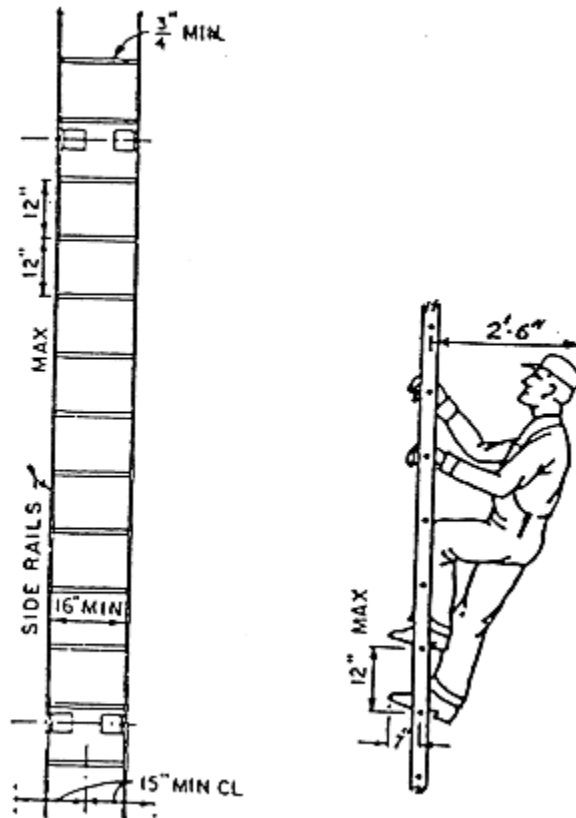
Rail Ladder With Bar Steel Rails and Round Steel Rungs
